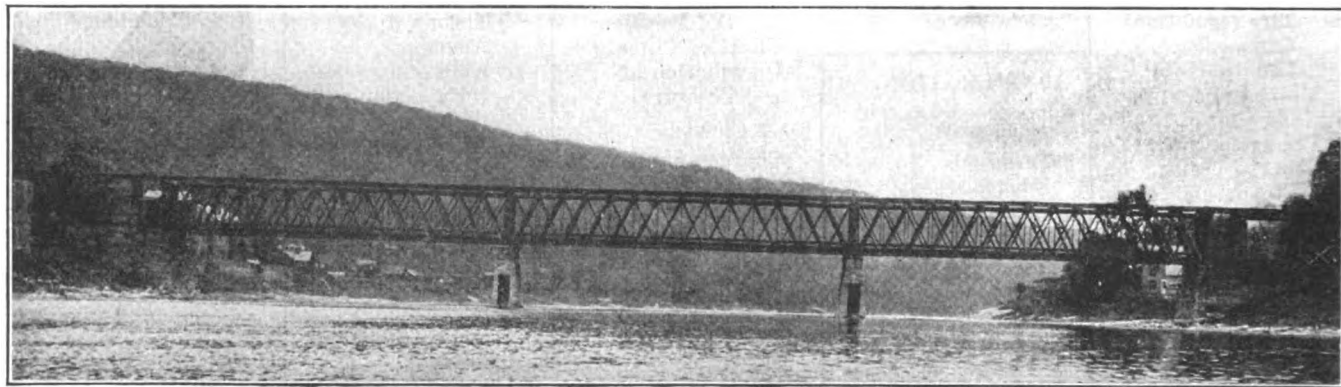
DOUBLE-DECK HOWE-TRUSS BRIDGE CARRYING RAILWAY TRAFFIC
